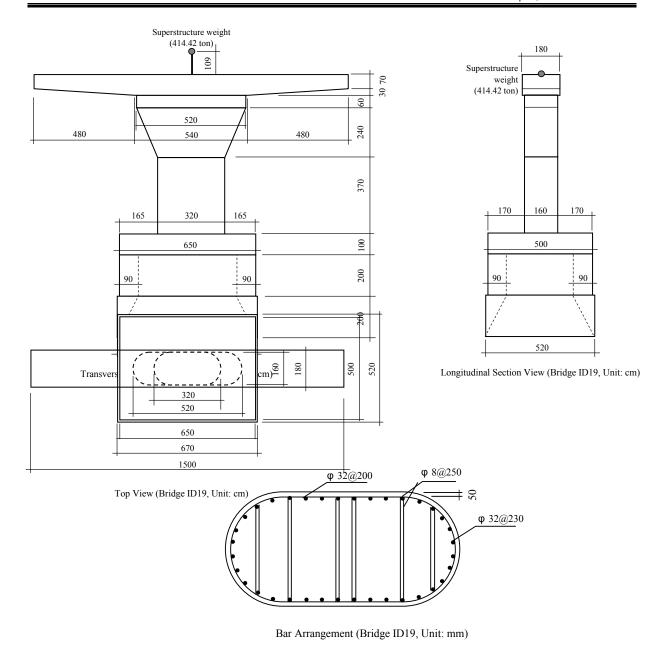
Dimension of bridge pier and bar arrangement (Bridge No.19)
